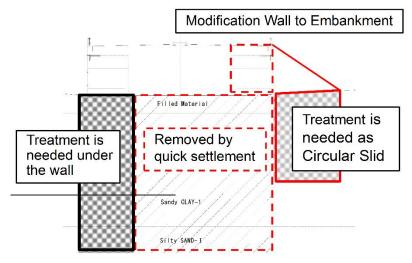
Comparison of Retaining Wall with Foundation (Toll Gate Section)
